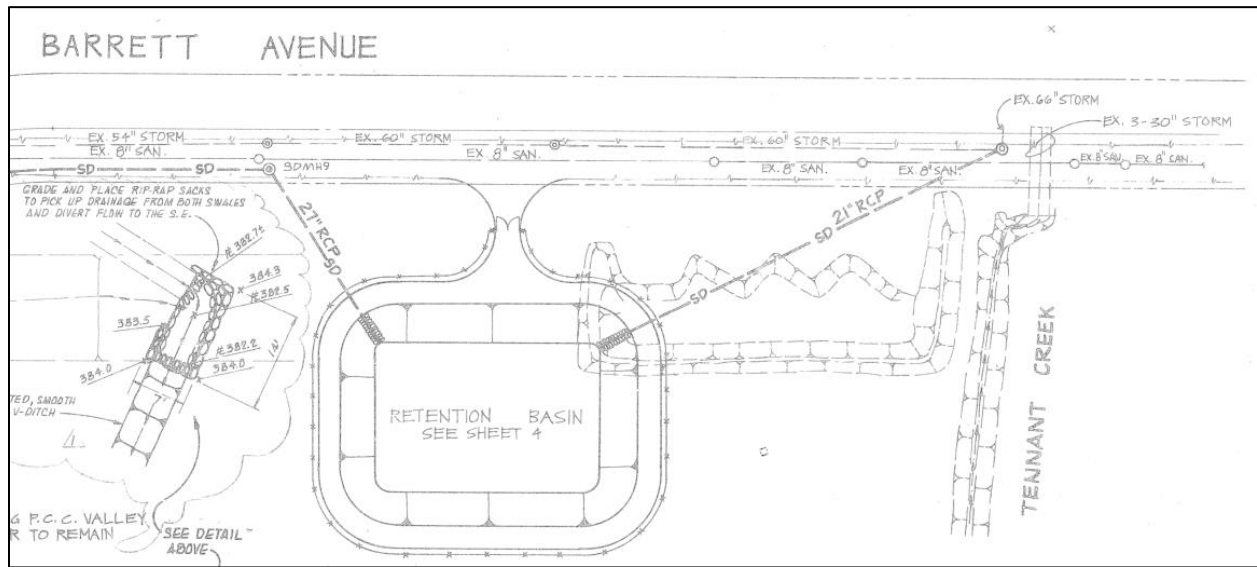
Existing 30-inch RCP Culverts at Barrett Avenue
